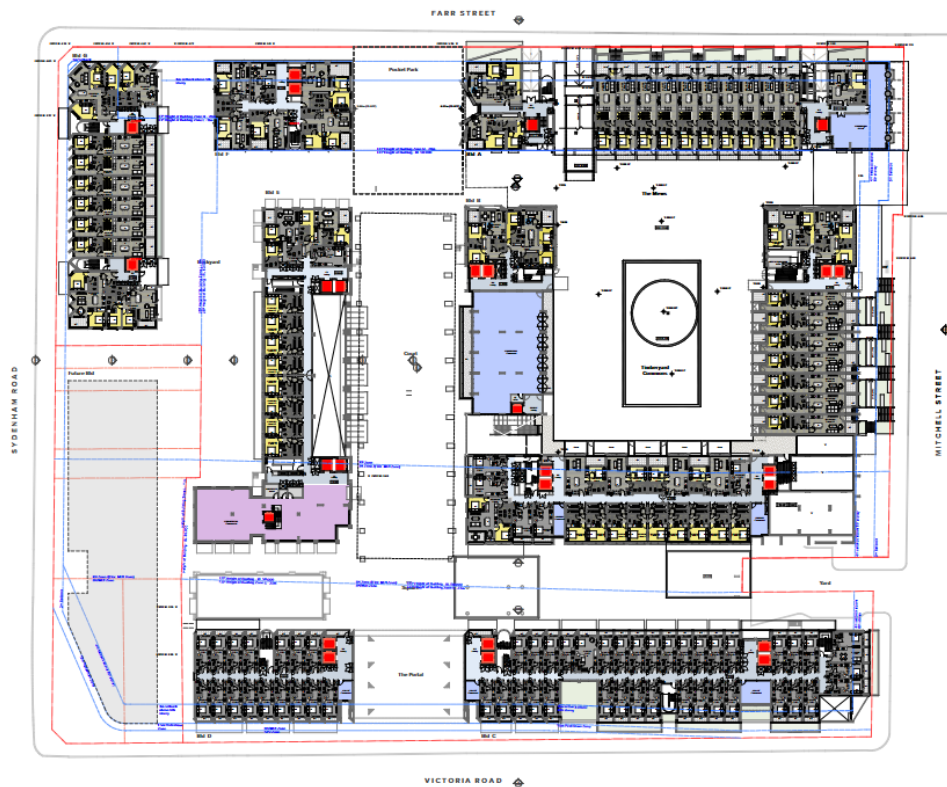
Extract of proposed plans showing upper ground level (Farr Street).
